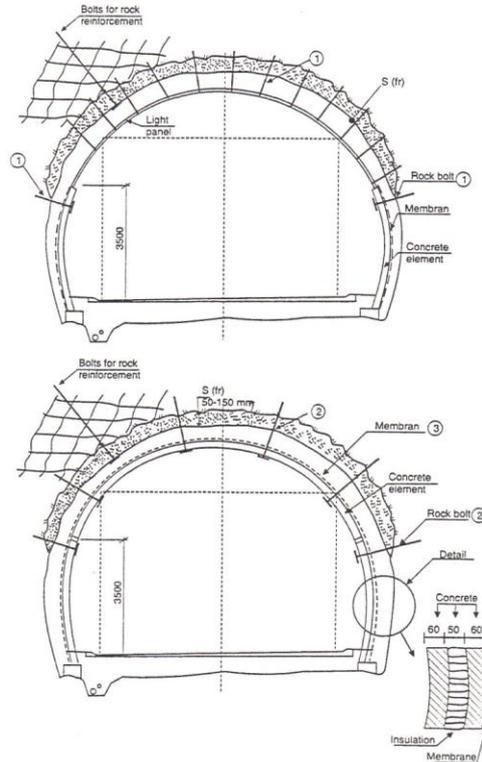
NMT Tunnel Linings are Drained but the Carriageway is Dry. (After Kvelsvik and Karlsrud, 1995)
